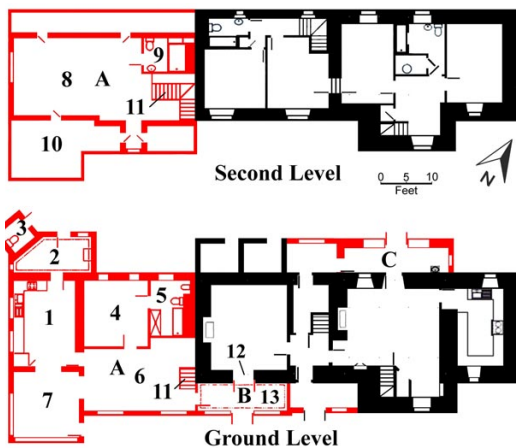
floor plan of Notts/Woodburn house after third major modification; ground level (A) with kitchen (1), porch (2), water closet (3), bedroom (4), bathroom (5); drawing room (6), conservatory (7); second level with bedroom (8), bathroom (9), under-eave storage (10); new staircase (11); enclosed porches (B & C); garden door (12); skylight (13).
